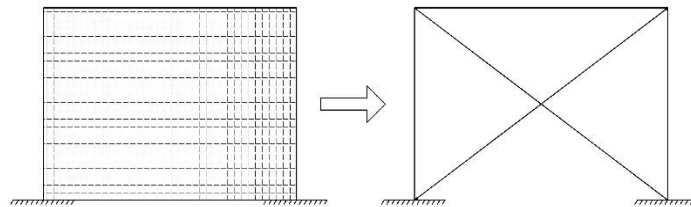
Infilled-masonry Equivalent Compression Strut.
